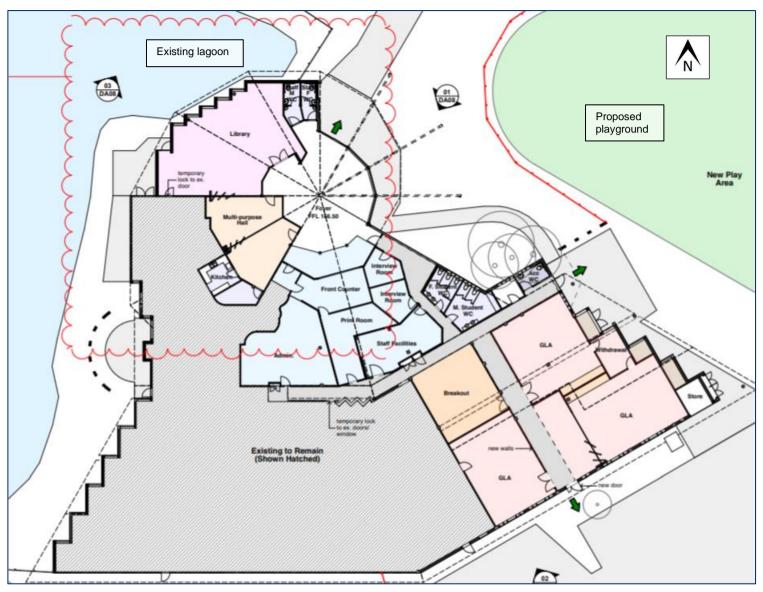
| Proposed internal floor plan (Source: Applicant's RTS)
